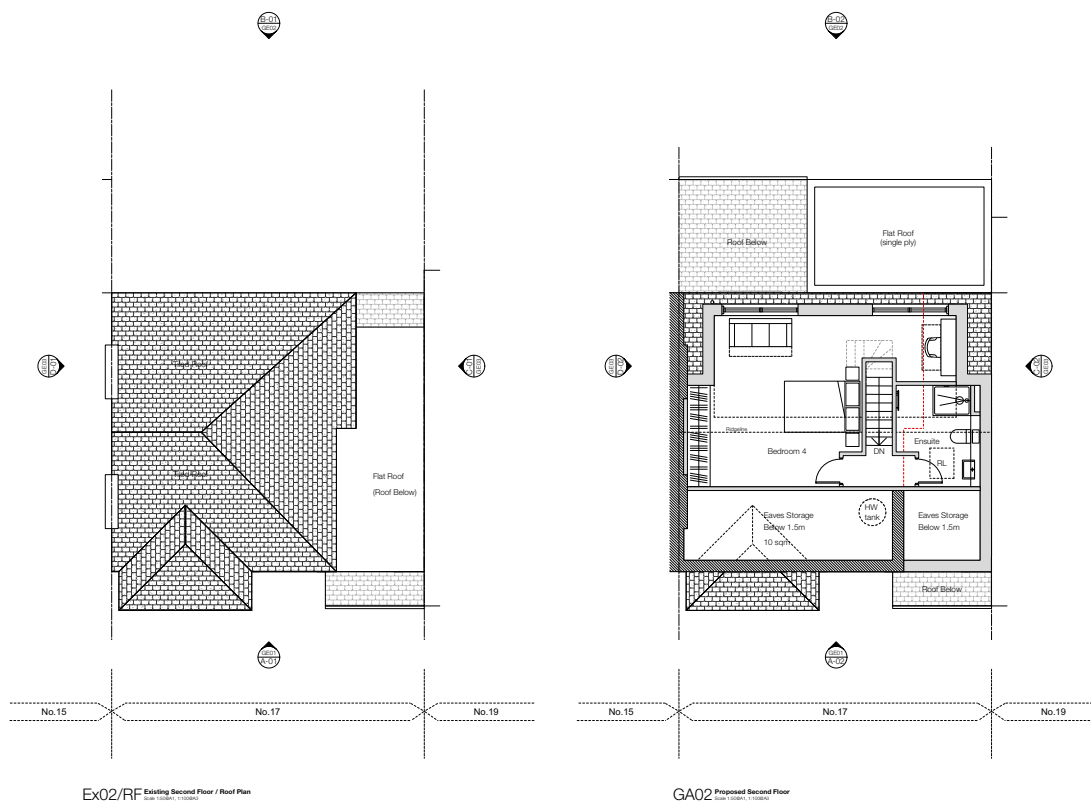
Existing and Proposed Second Floor/Roof Plans (not to scale)
